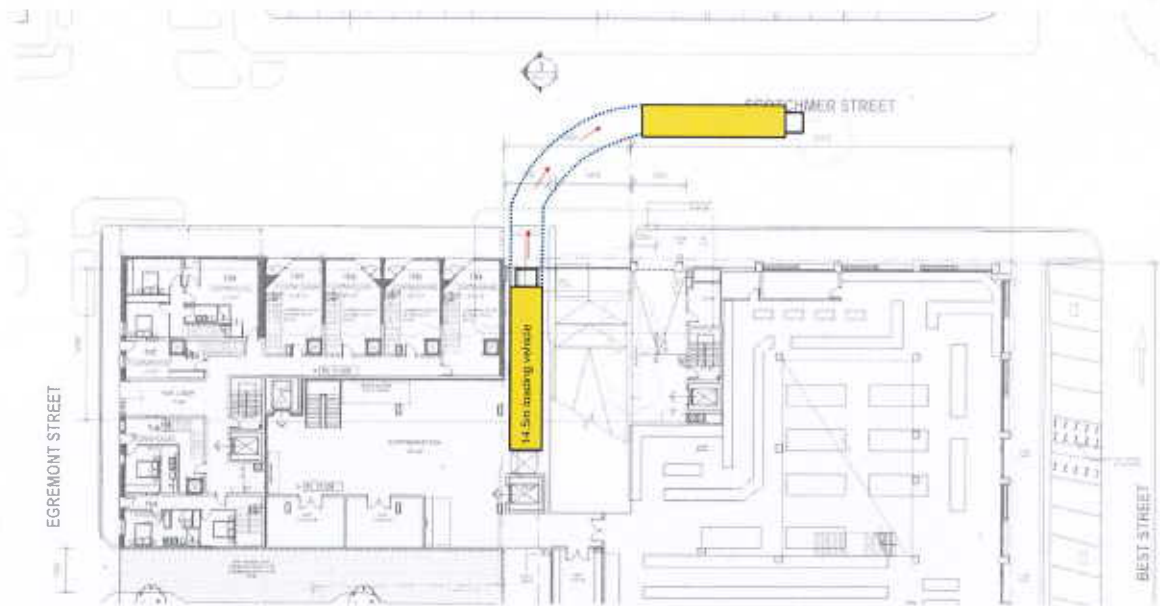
Ground Floor Loading Dock Flow Diagram – Egress (14 meter long vehicle)
